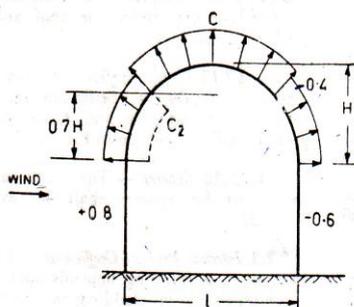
wind pressure distribution for roof on elevated structure as per is: 875(part-3)
